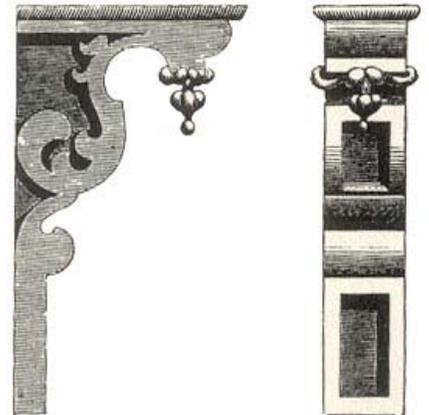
Ornate saw cut door and roof brackets found on both Italianate and Second Empire buildings.
